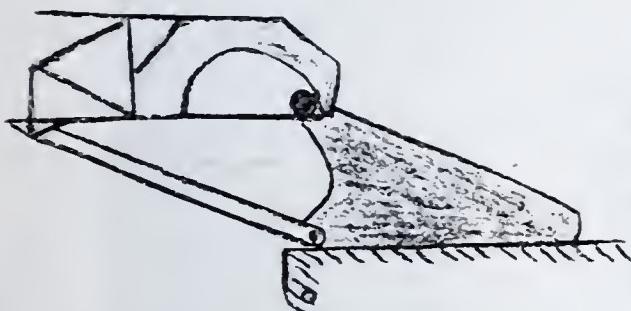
A Schlinke Type of Lift Bridge at Milwaukee, Wis.
